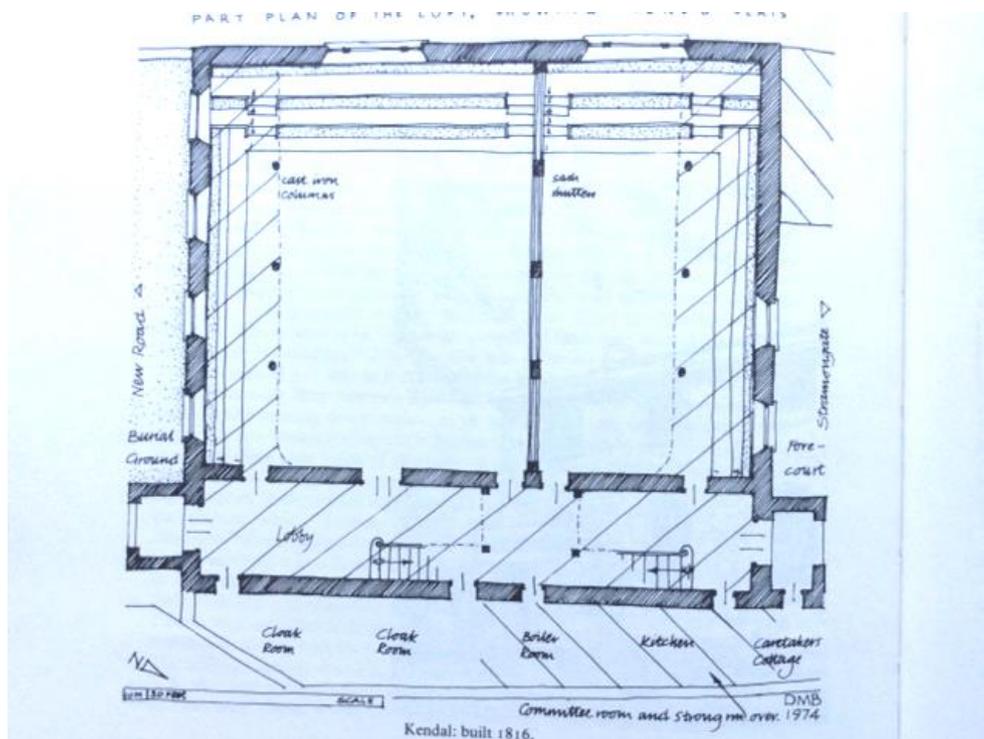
Ground floor plan of the meeting house as reconstructed by Butler (north is to the right; not to scale) (Butler (1978), p.102)
